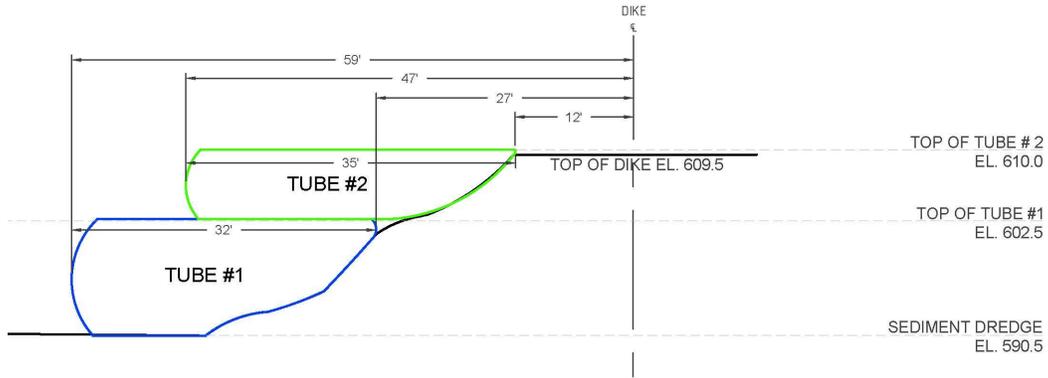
As-Built Pilot Test Cross Section A-A' (Ref. 4)
